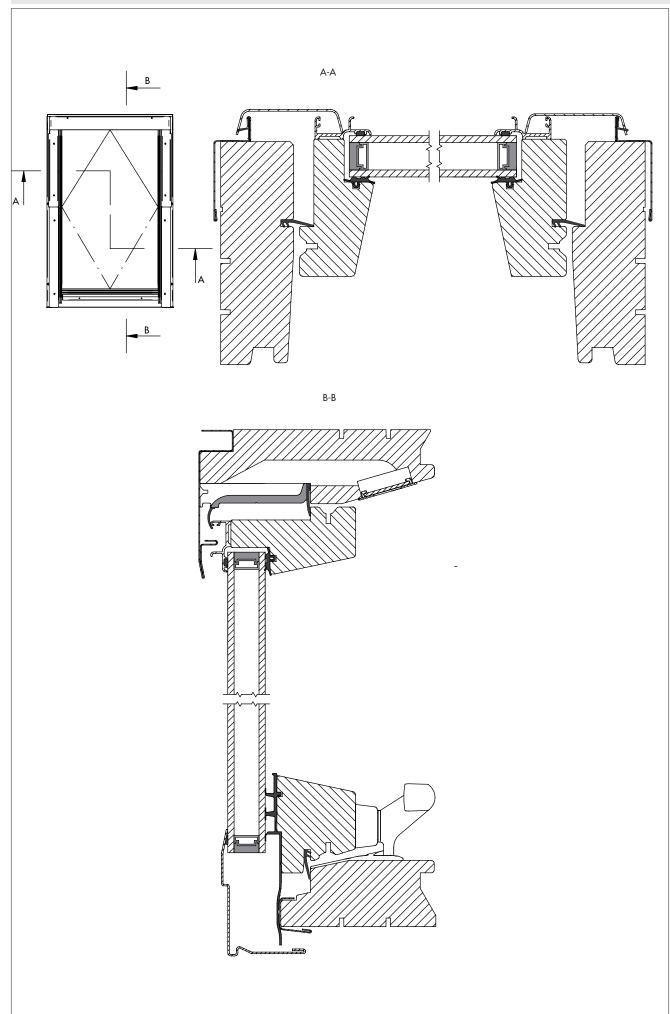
FTT U5 Centre Pivot Roof Window cross-sections
